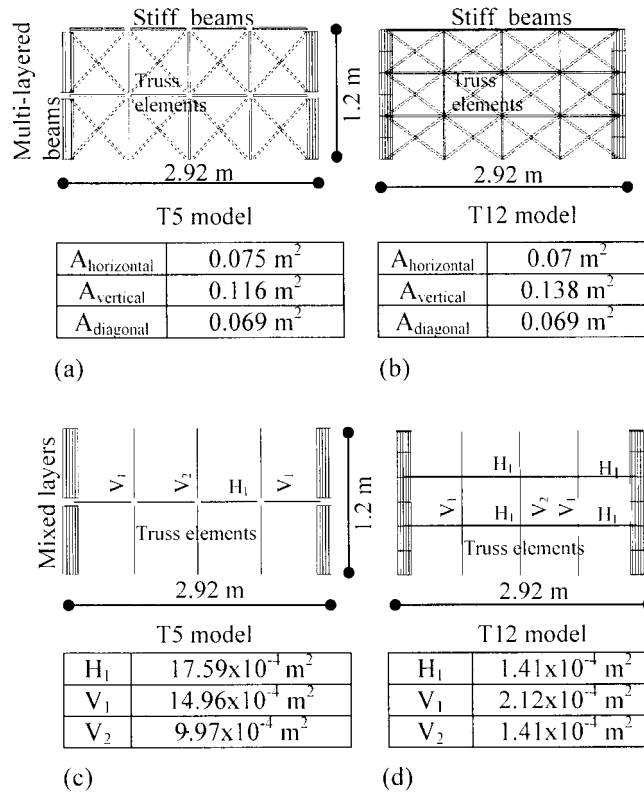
SAFE: concrete mesh and section of truss elements for (a) T5 specimen and (b) T12 specimen: steel mesh and section of truss elements for (c) T5 specimen and (d) T12 specimen.
